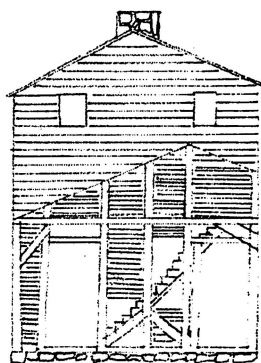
Conjectural elevations of the east facade of the Barker-Young house.
